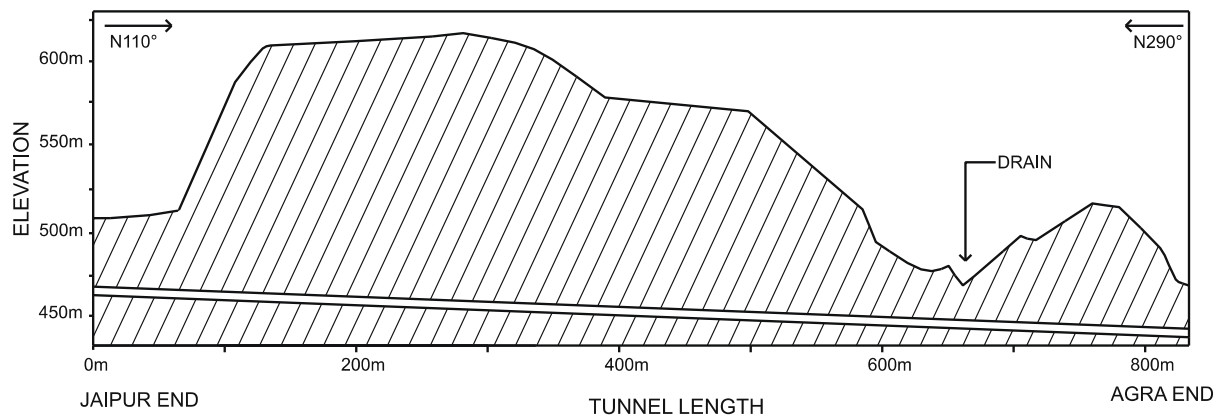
Longitudinal section along tunnel through Jhalana hill
